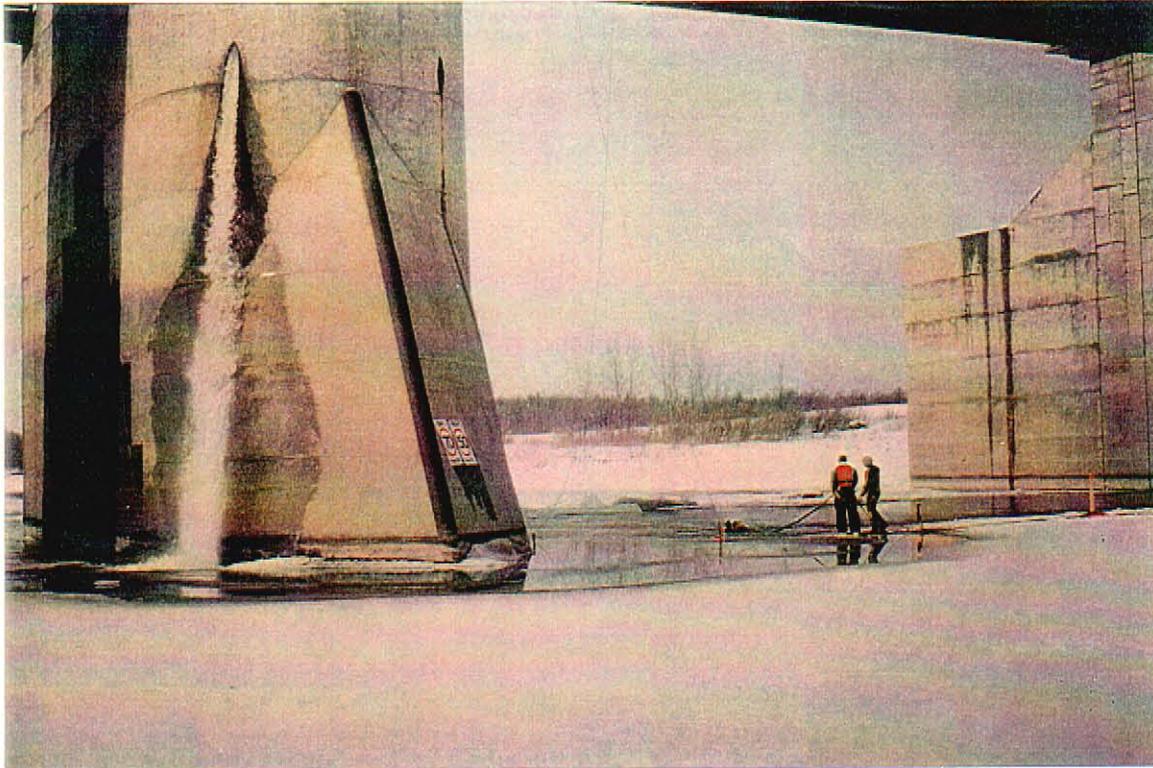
SEALING EAST GATE MARCH 11/96 - DEWATERING PUMP OPERATING
